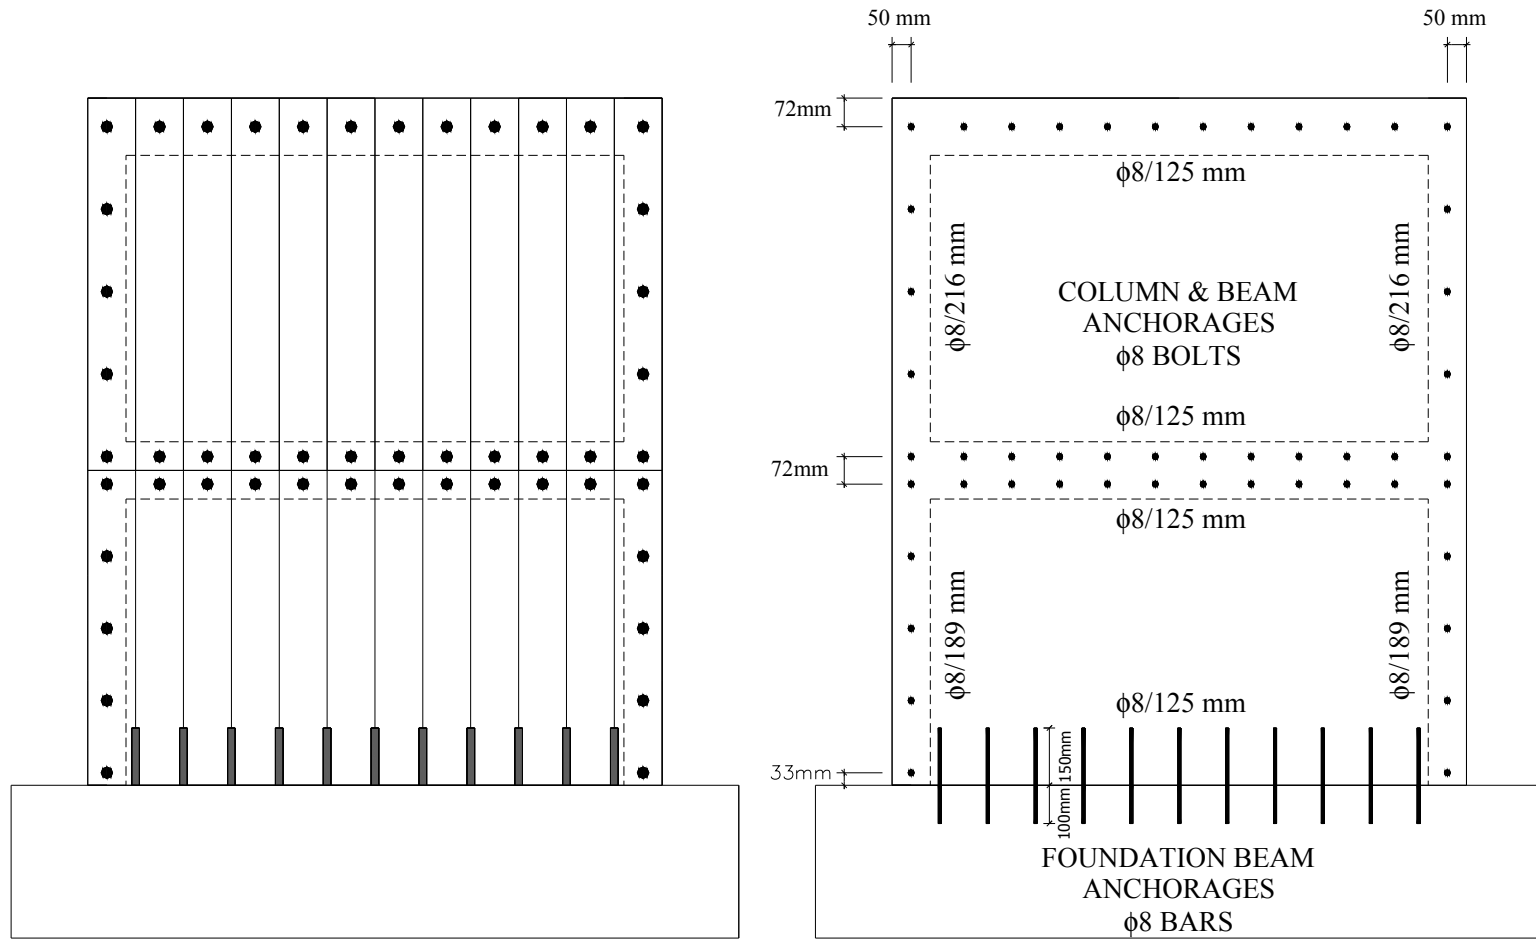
Panel arrangement and configuration of the dowels for Specimen CEF4
